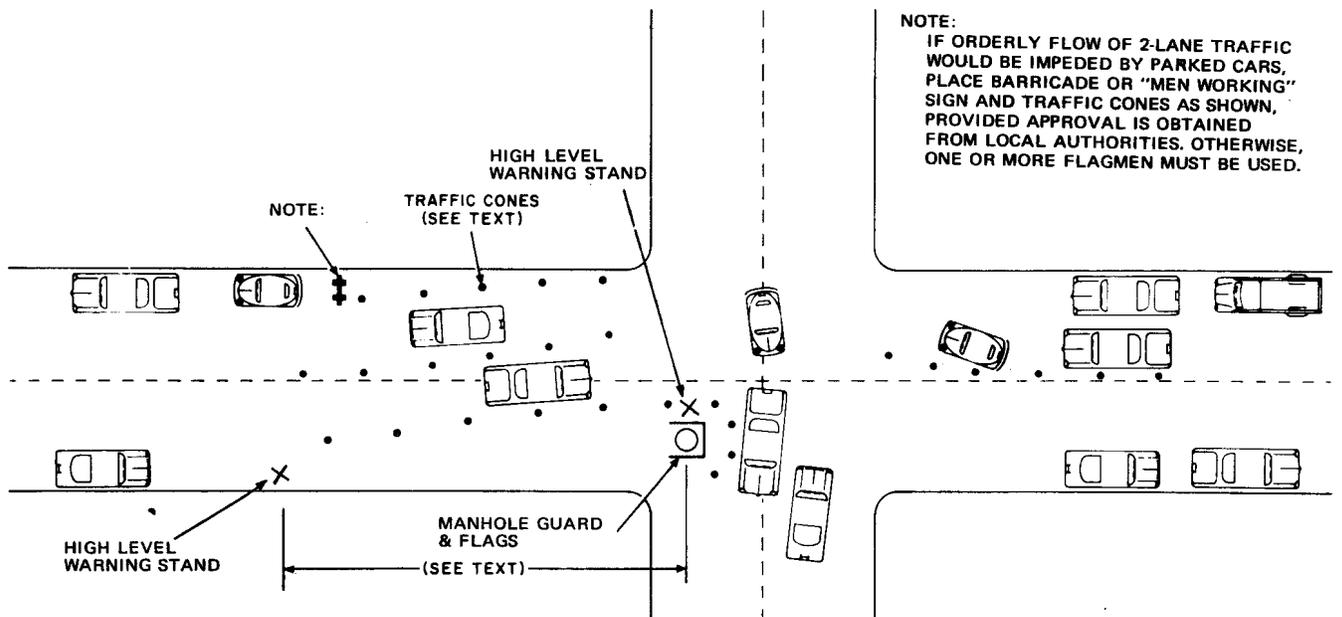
Placement of Warning Devices on City Street Without Truck - Underground Plant in Intersection
